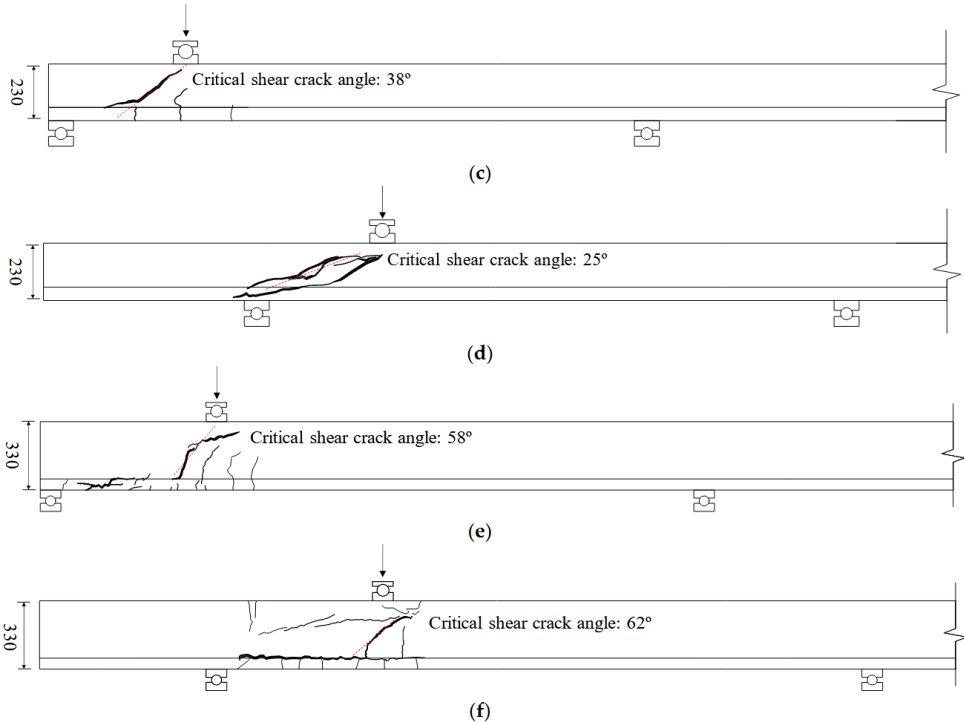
Crack patterns at failure: c-d) precast test, e-f) composite slab [72]
